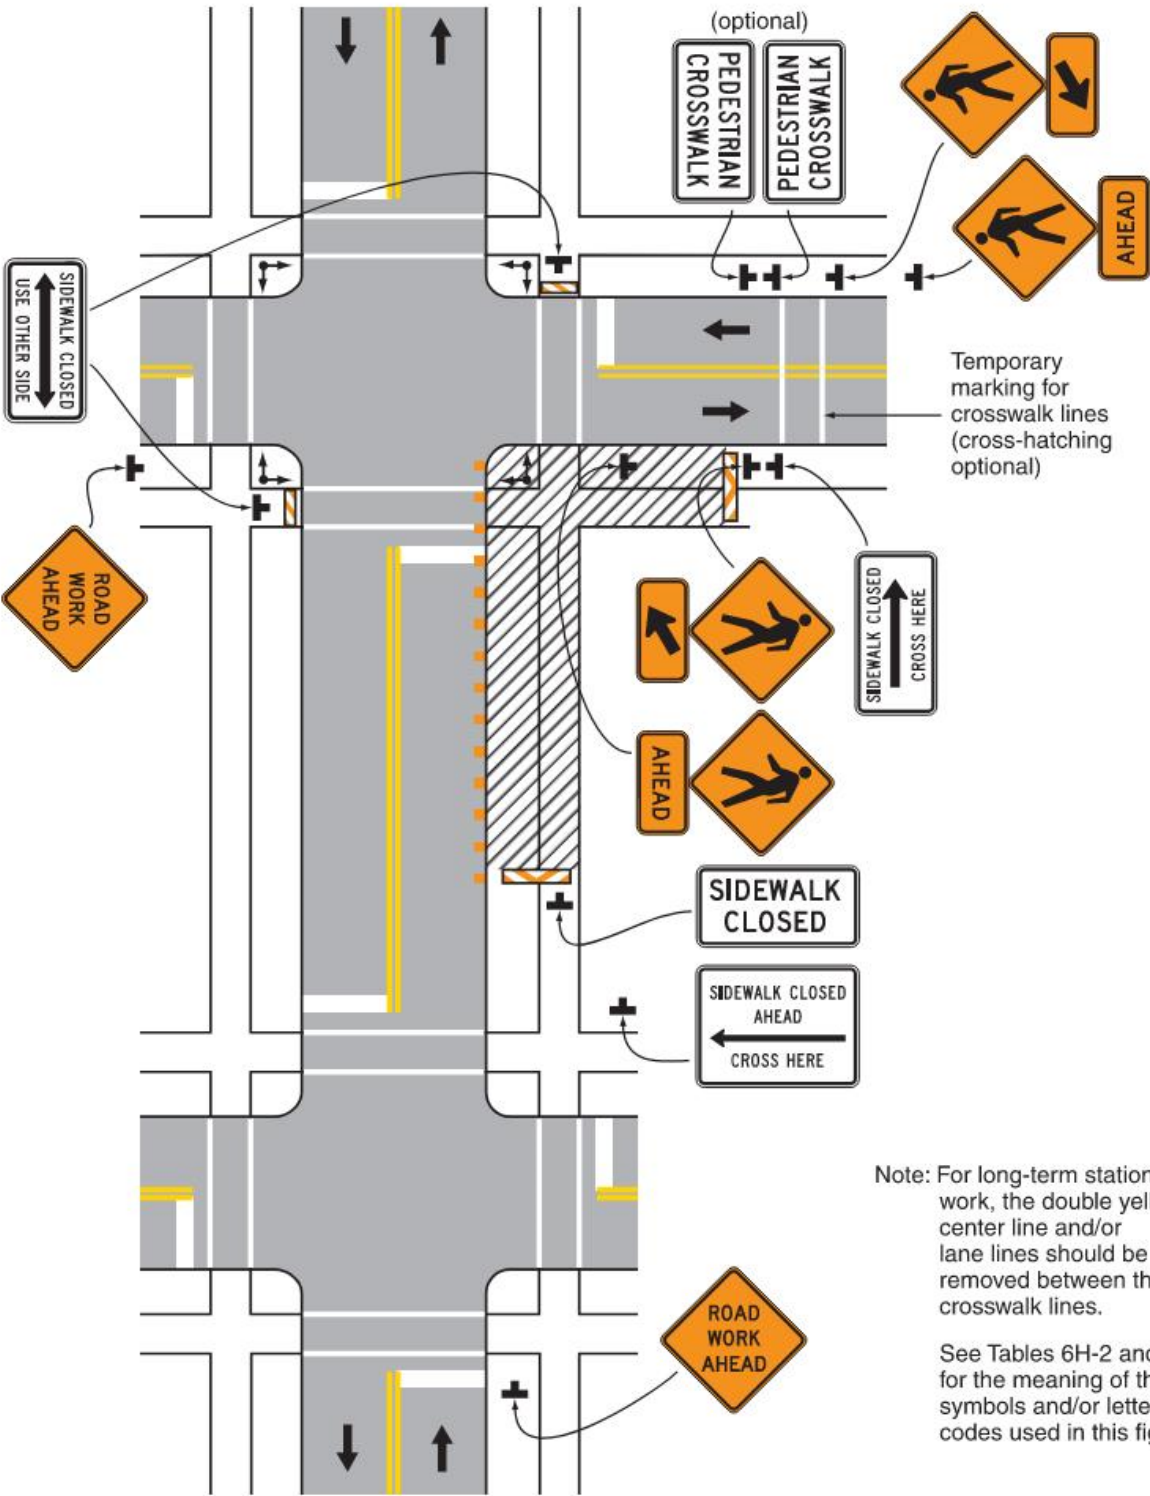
H-28. Sidewalk Detour or Diversion (TA-28)
